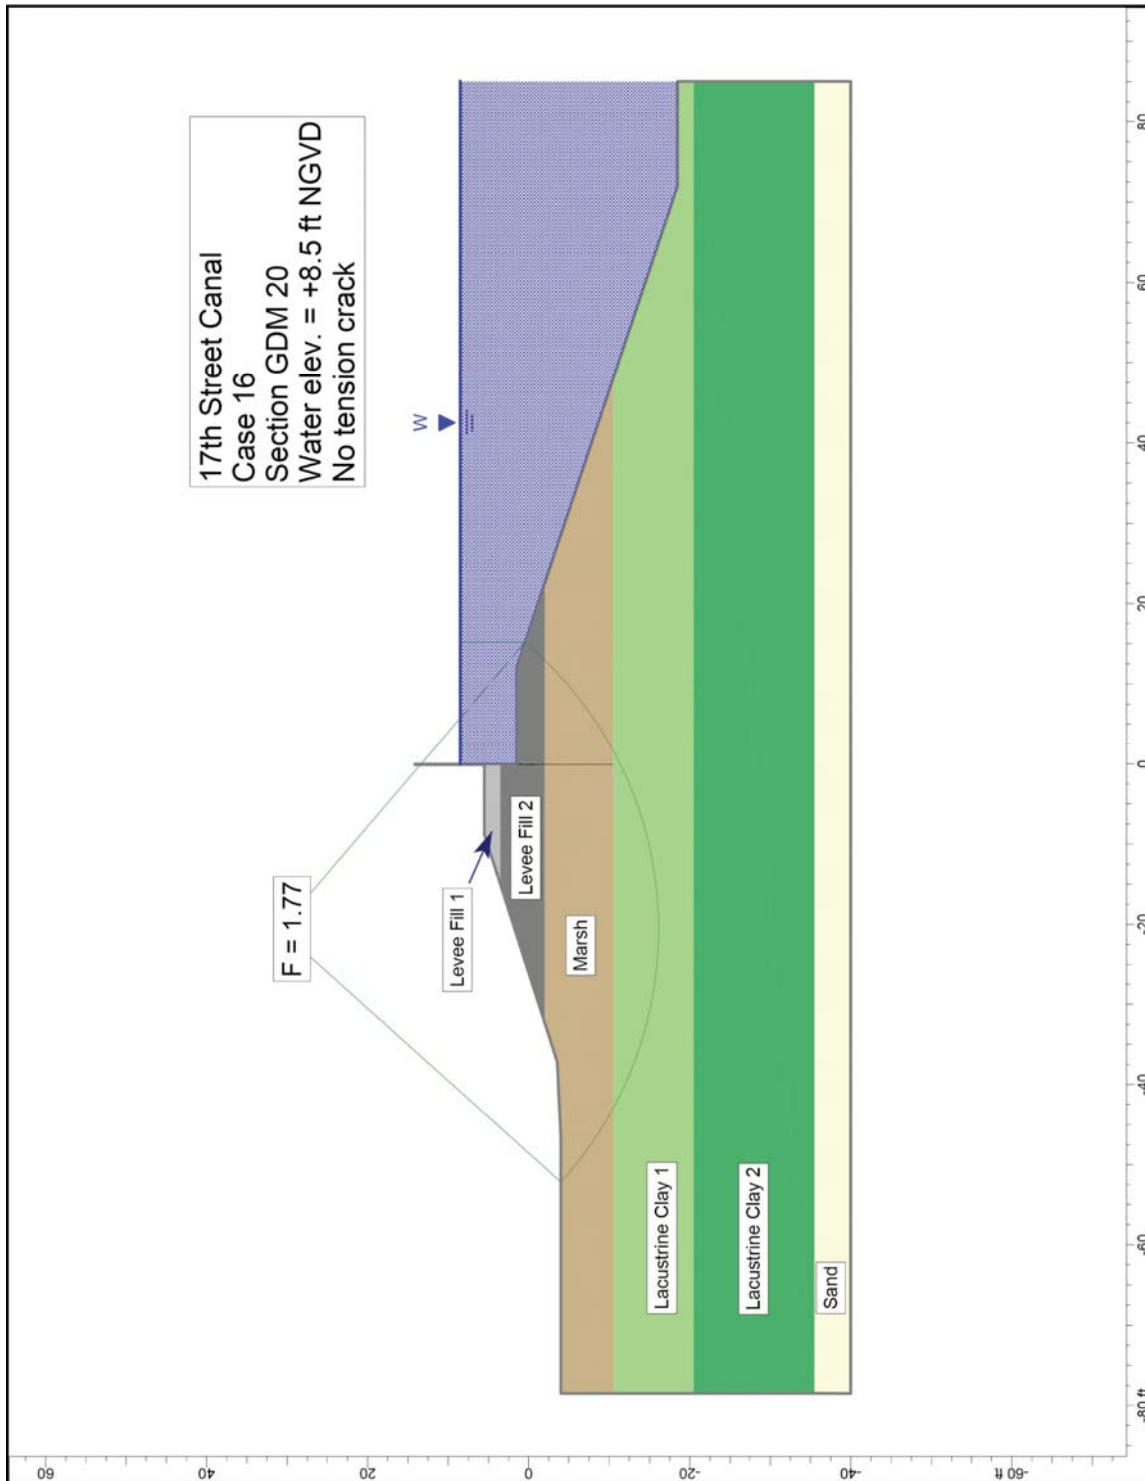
Critical circle for 17th Street Canal Design cross section – water elevation 8.5 ft, no tension crack.
